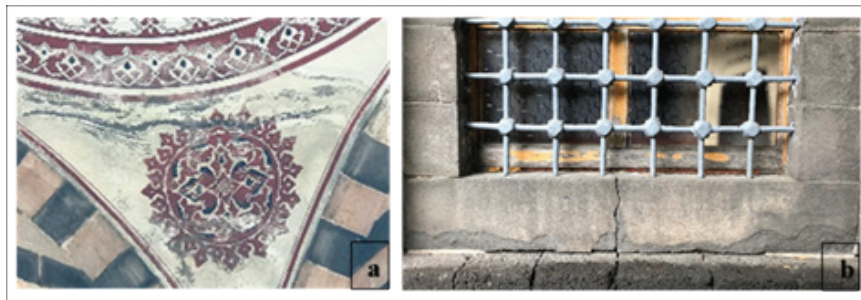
Scaling/Peeling a. Pendant on the North Façade b. Window on the South Façade
